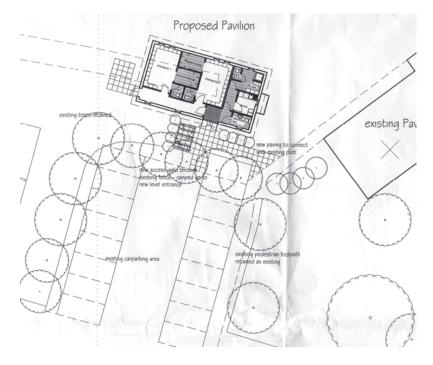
Plan of proposed new pavilion. Plan provided by developer.
